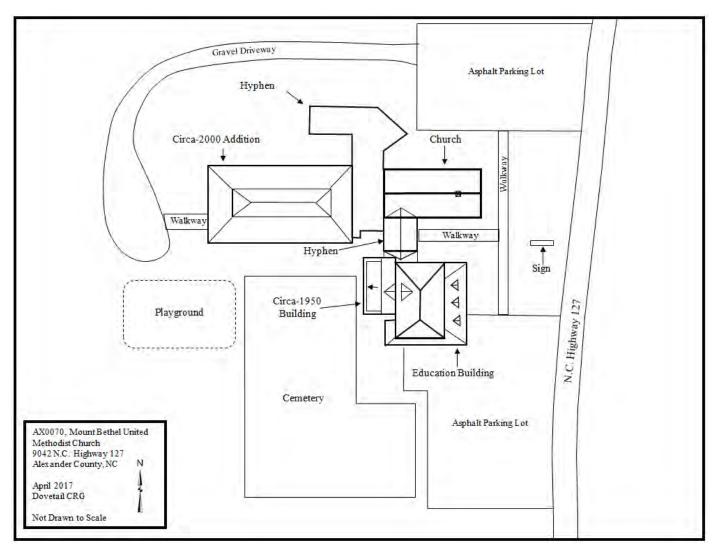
Site Plan for the Mount Bethel United Methodist Church (AX0070).
